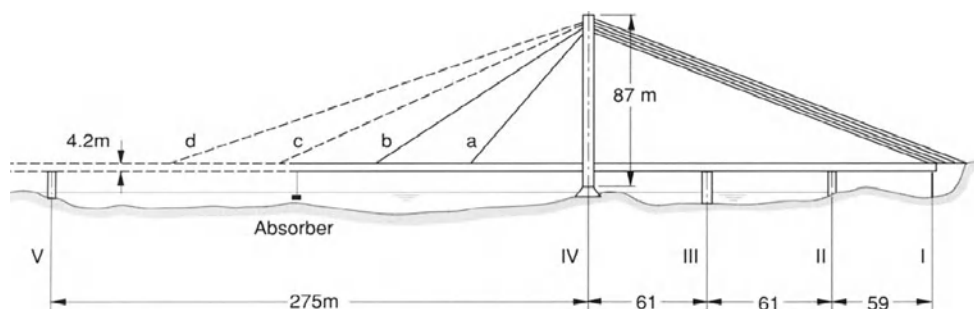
Cantilever construction of a cable-stayed bridge with preventive damping measures [3.23]
